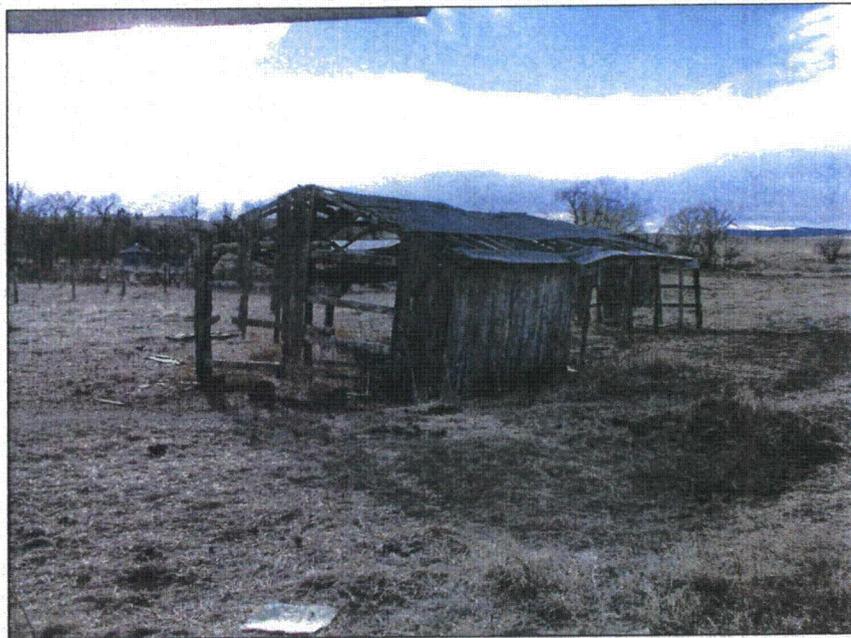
25DW315. Northeast elevation of S6. Sam Cason, 1-14-06.
